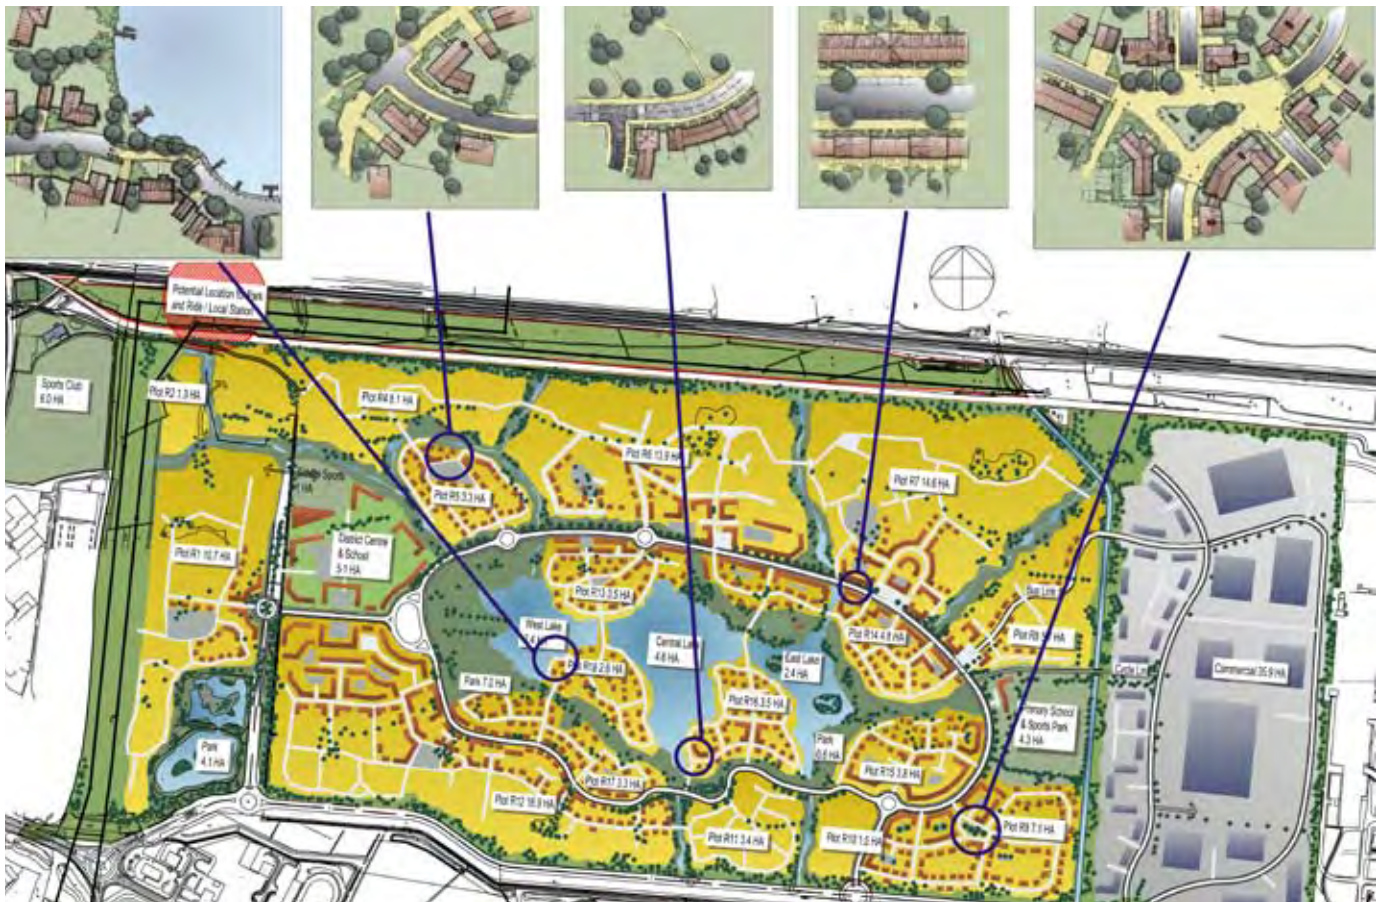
Corus Steelworks site at Llanwern. The first site plan showed a single loop road linking some 18 residential sites around the three new lakes, and some early ideas about their differential layout and design. The 'district centre' and school was located to the west, and a large business/industrial park to the east.
